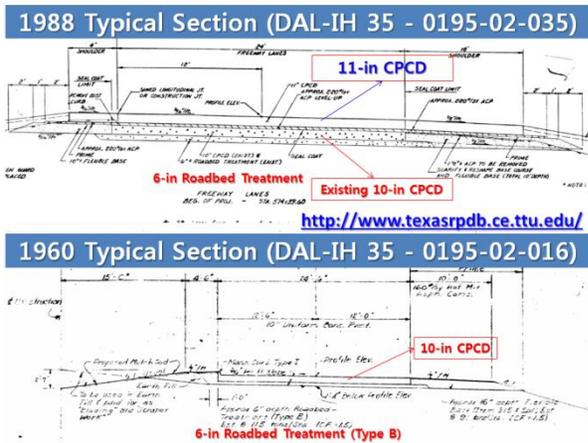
Typical Section of IH 35 in Dallas District-Denton County
